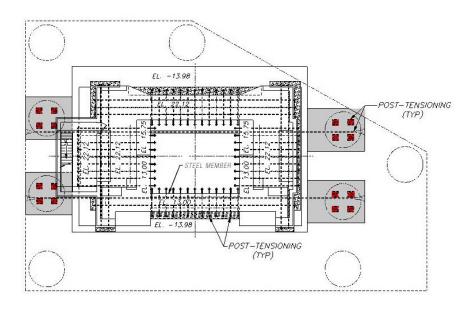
Bascule Pier Wall – Rehabilitation Option 1 (Plan Detail)
